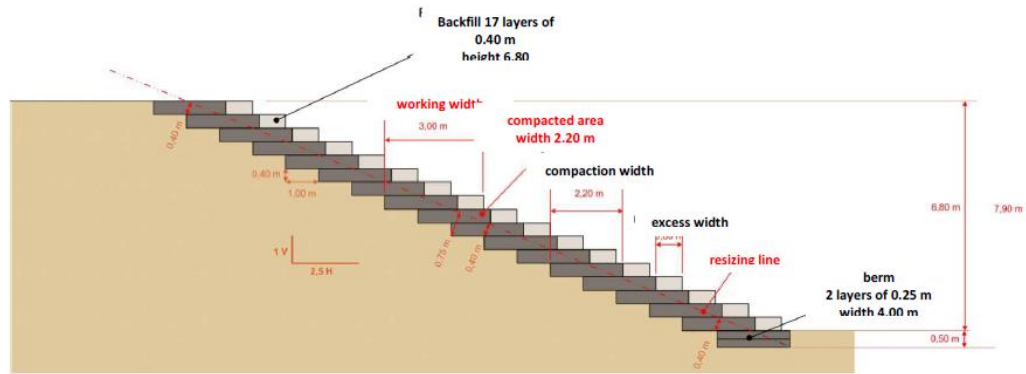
Construction methodology: stage 2: implementation of the first part of the berm and 17 layers of backfill.
